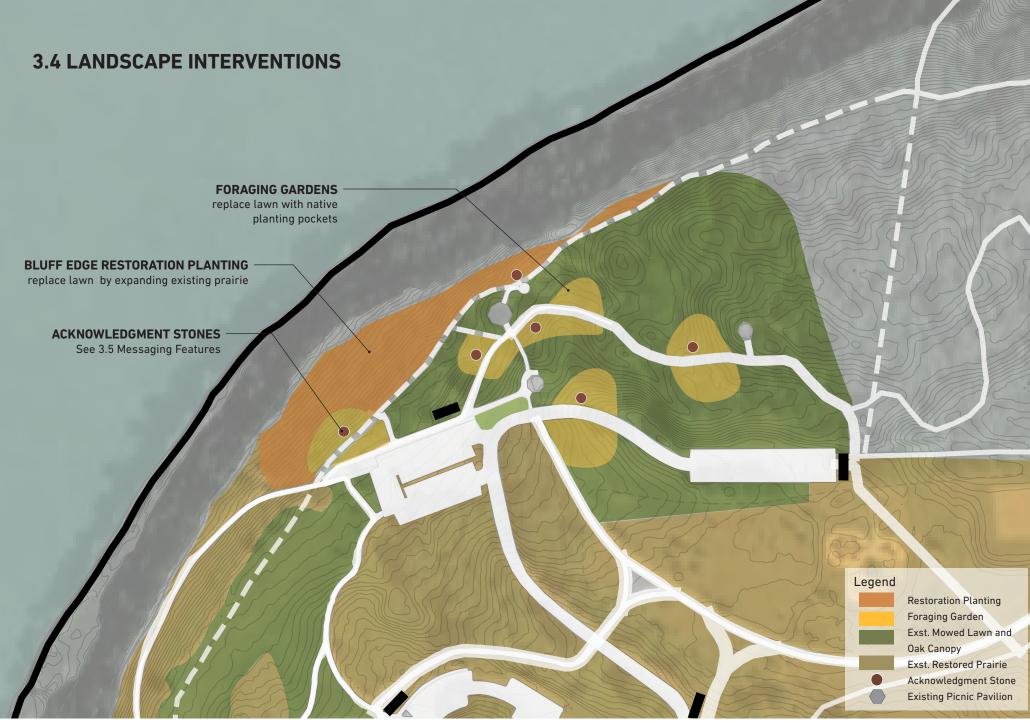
Schaar's Bluff Planting Intervention Plan
